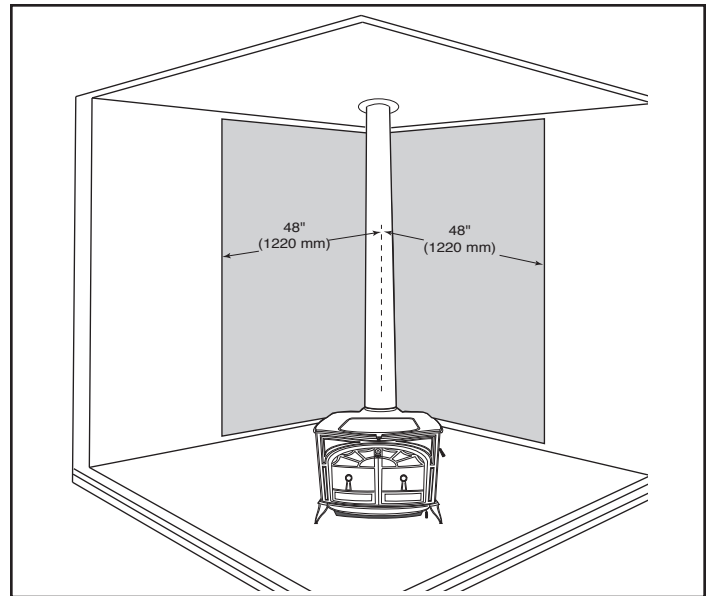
Corner installation, vertical chimney connector, two wall shields. Reduced side clearances. Wall shield MUST meet at corner.
